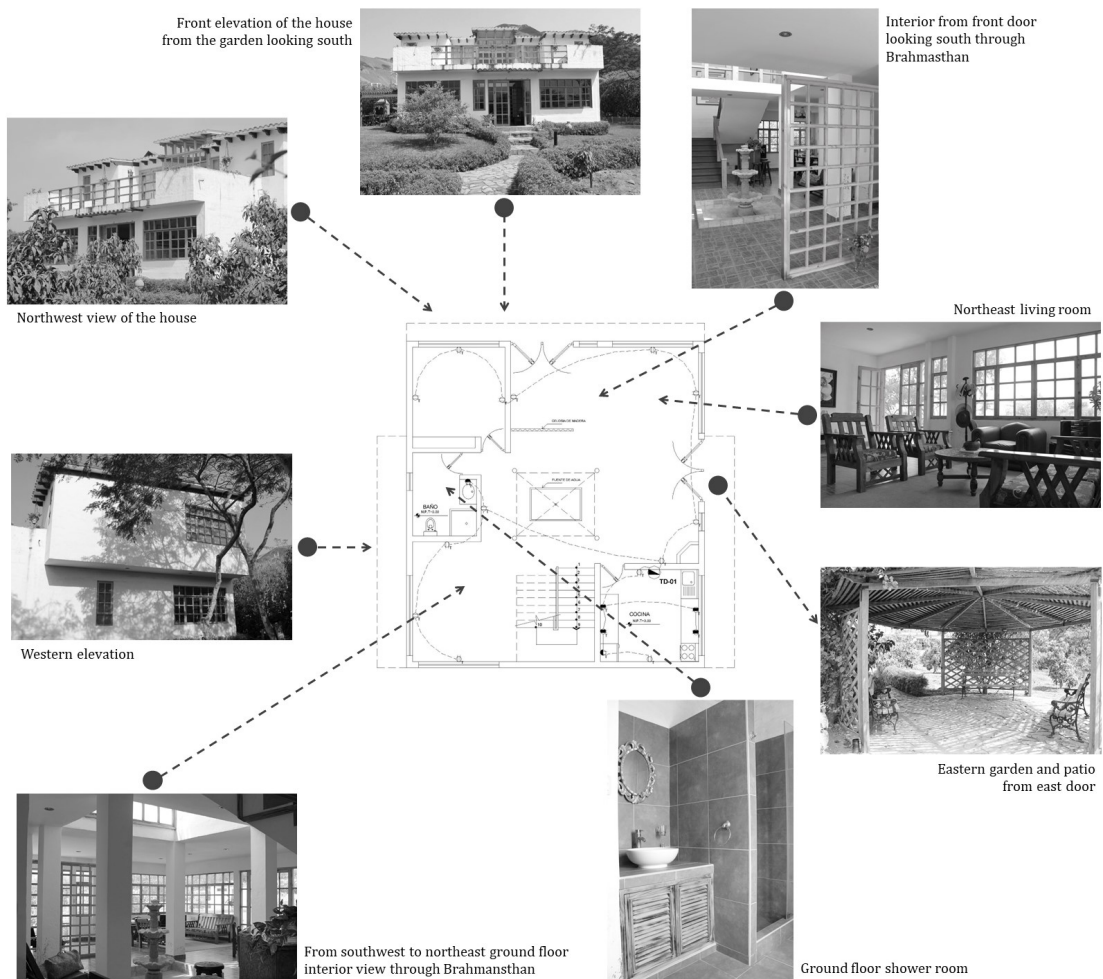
House No. 2 ground floor plan in relation to interior and exterior features and views
